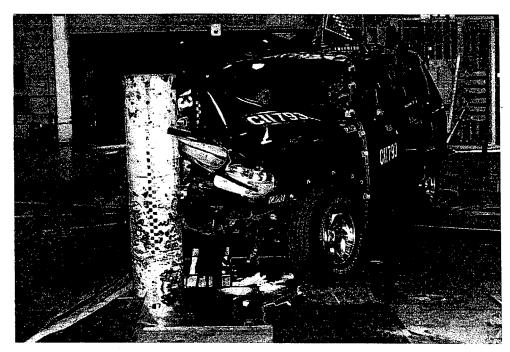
Post-Test Photograph of Test C11793, Front-Left View
